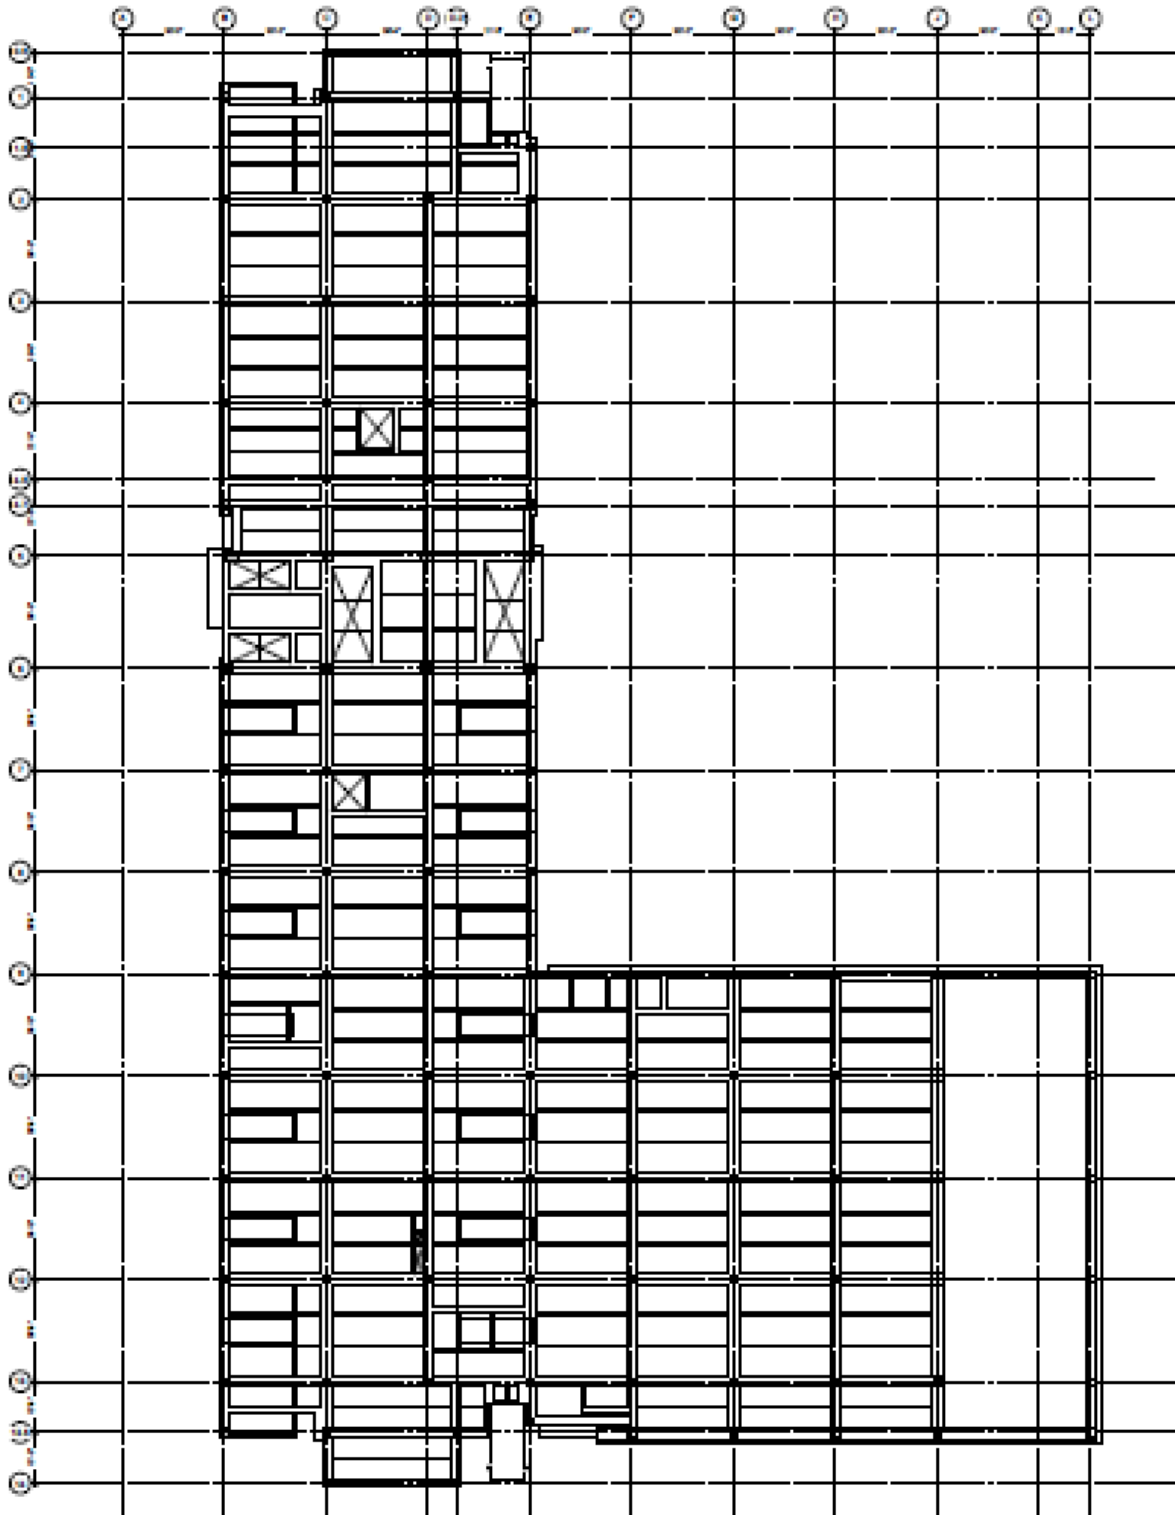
| Typical Structural Floor Plan for Floors 5-6 (Walter P. Moore)
